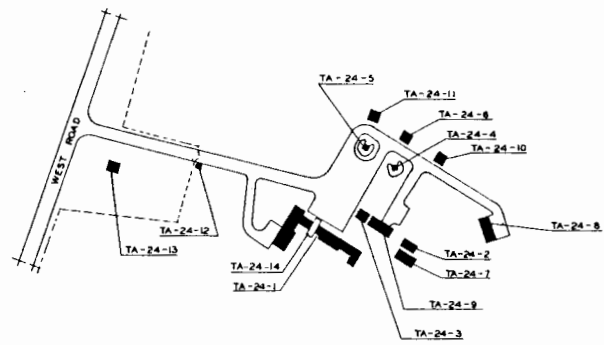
Structure Location Plan for TA-24 - T Site
